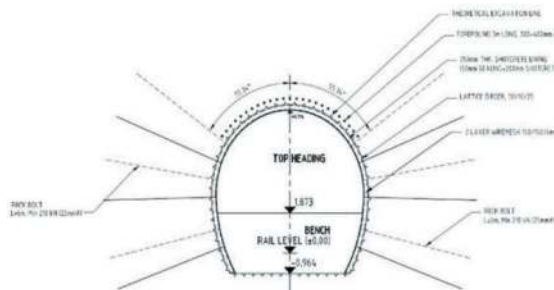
Support Class V construction methodology and Typical Tunnel Cross section with class V support arrangements.
